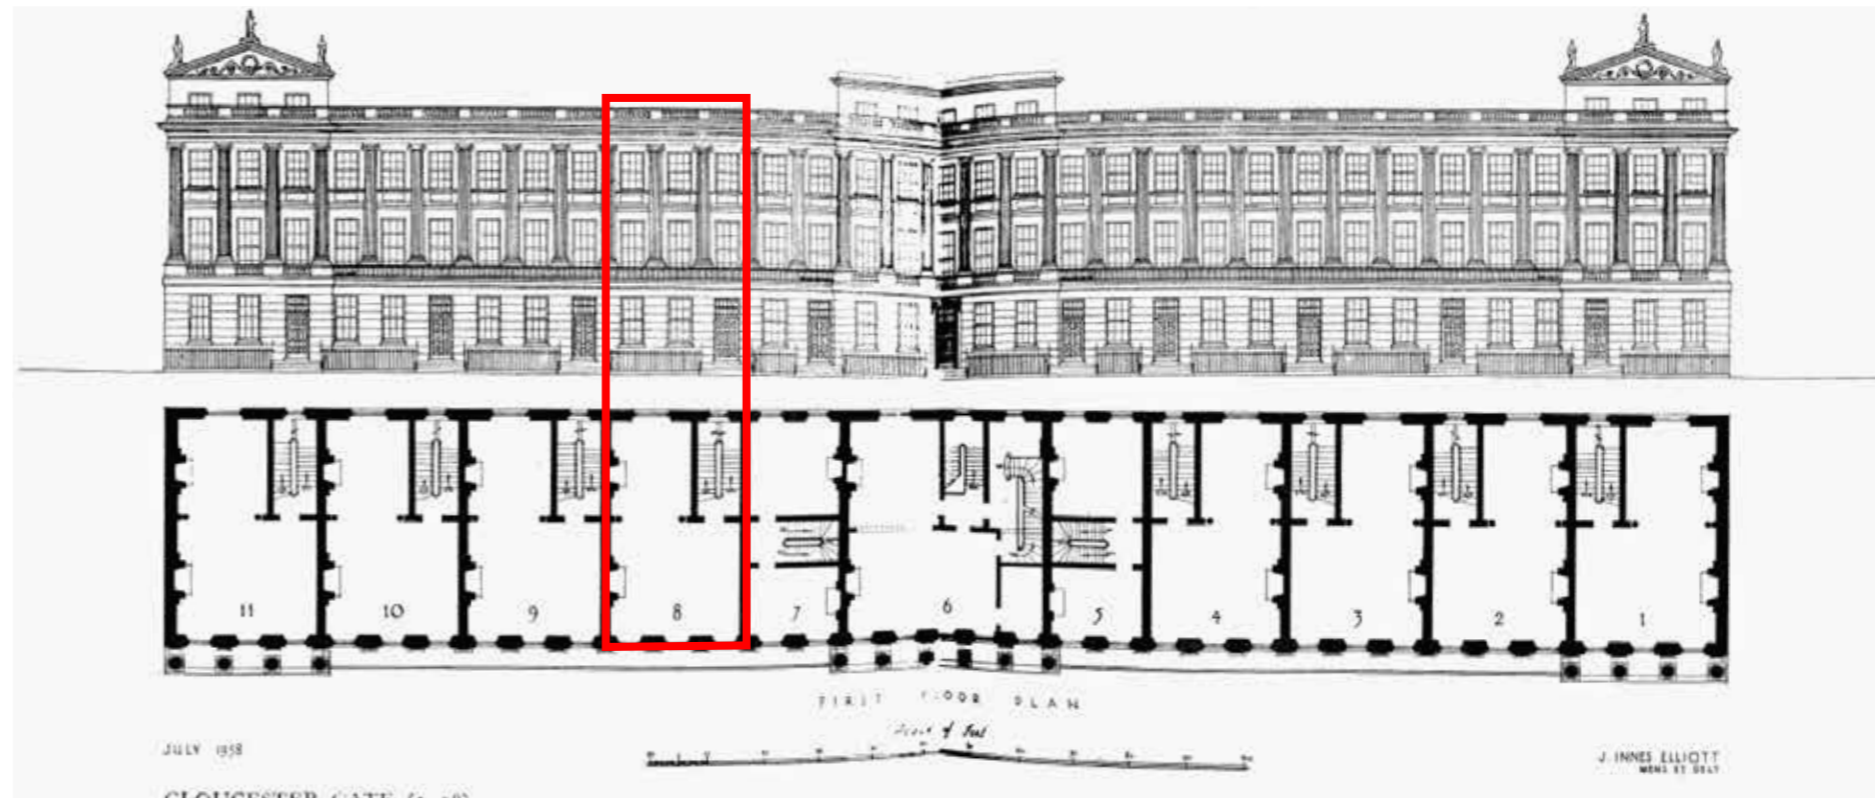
Plan and elevation of Gloucester Gate published in the Survey of London, 1938.
